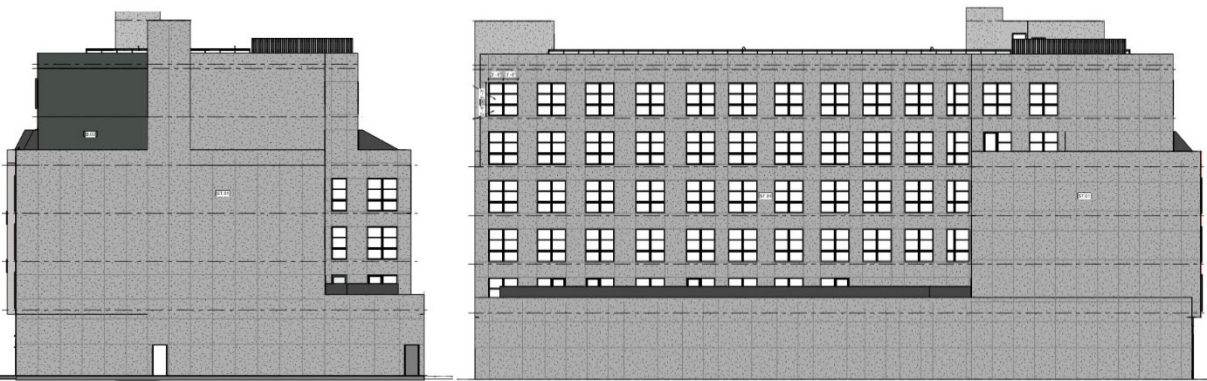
Architectural Elevations of Side (left) and Rear (right) of Proposed Building
